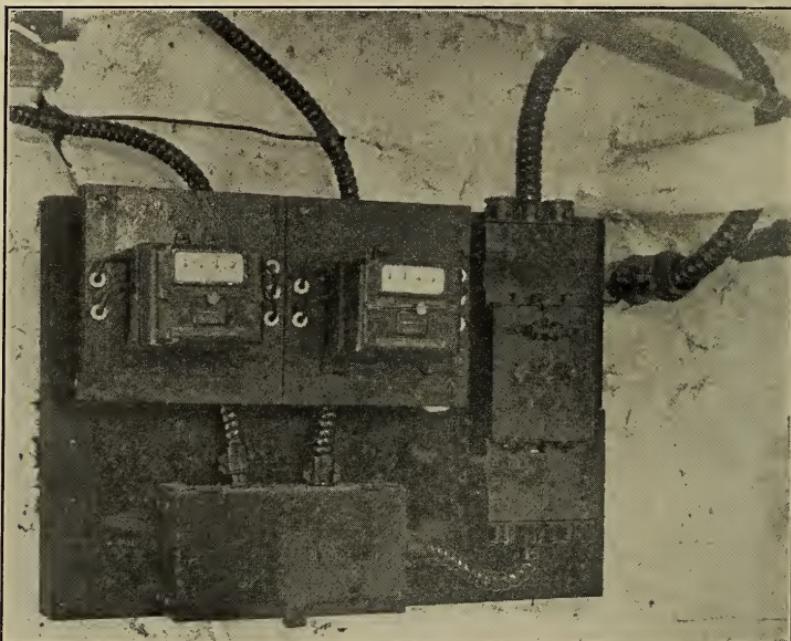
Typical Meter Installation, Alternating Current Service.
